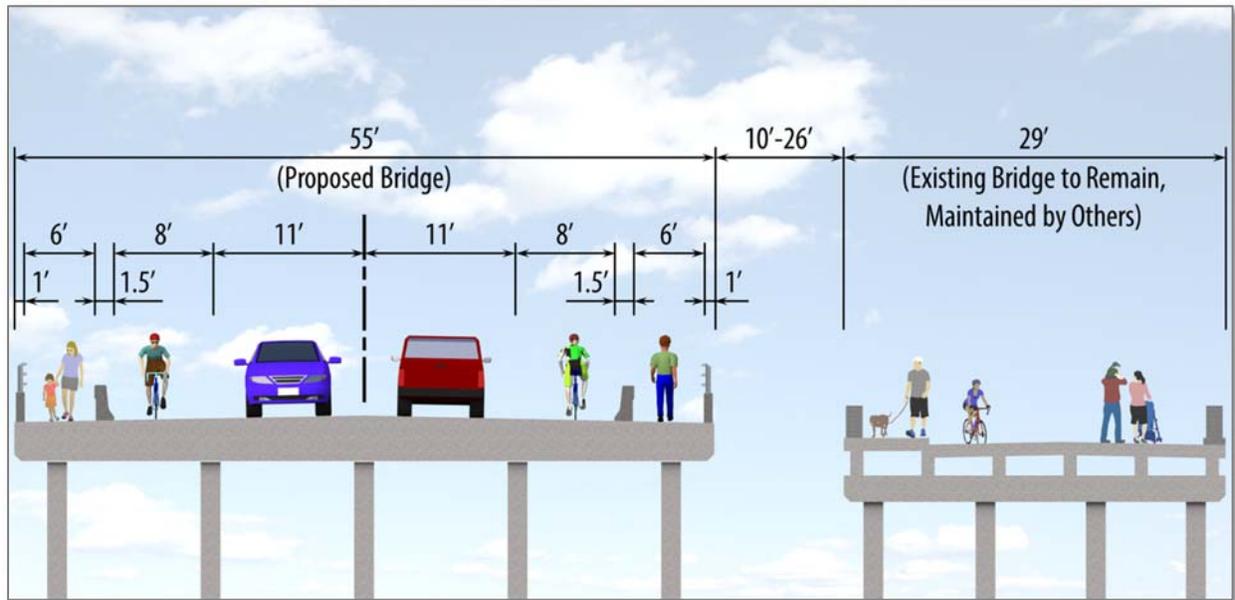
BUILD ALTERNATIVE 3 - BRIDGE TYPICAL SECTION
